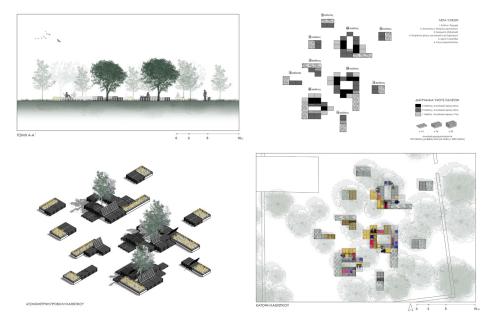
Plans for the installation of resting area soft equipment Source: MDAT
